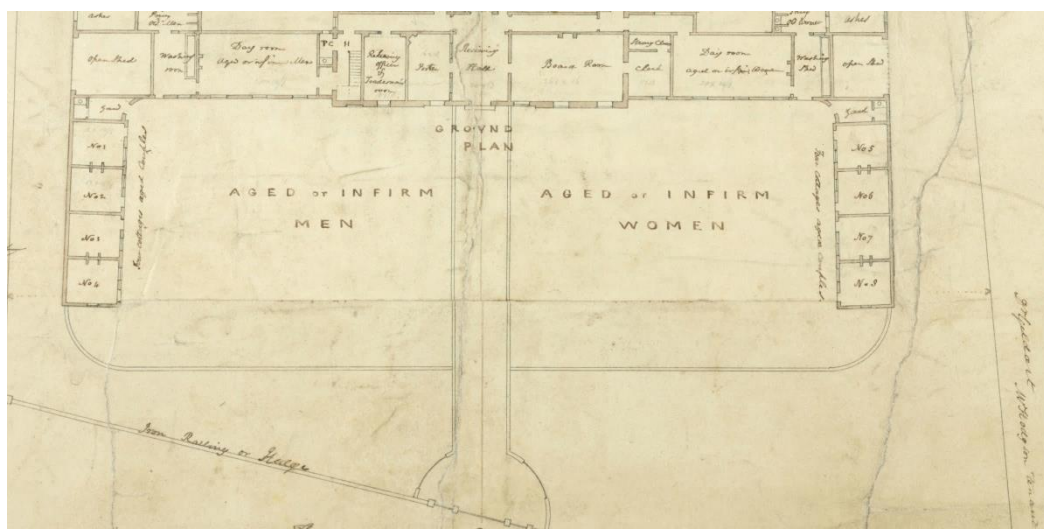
1837 ground plan, front (CA: G/C/AP16.1)
